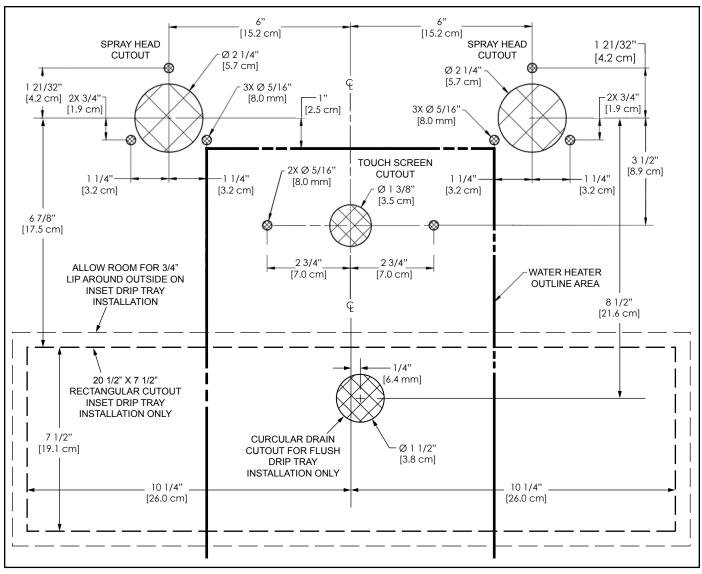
Hole Pattern Template for Cutting and Drilling Counter Top (Drawing Not to Scale)
